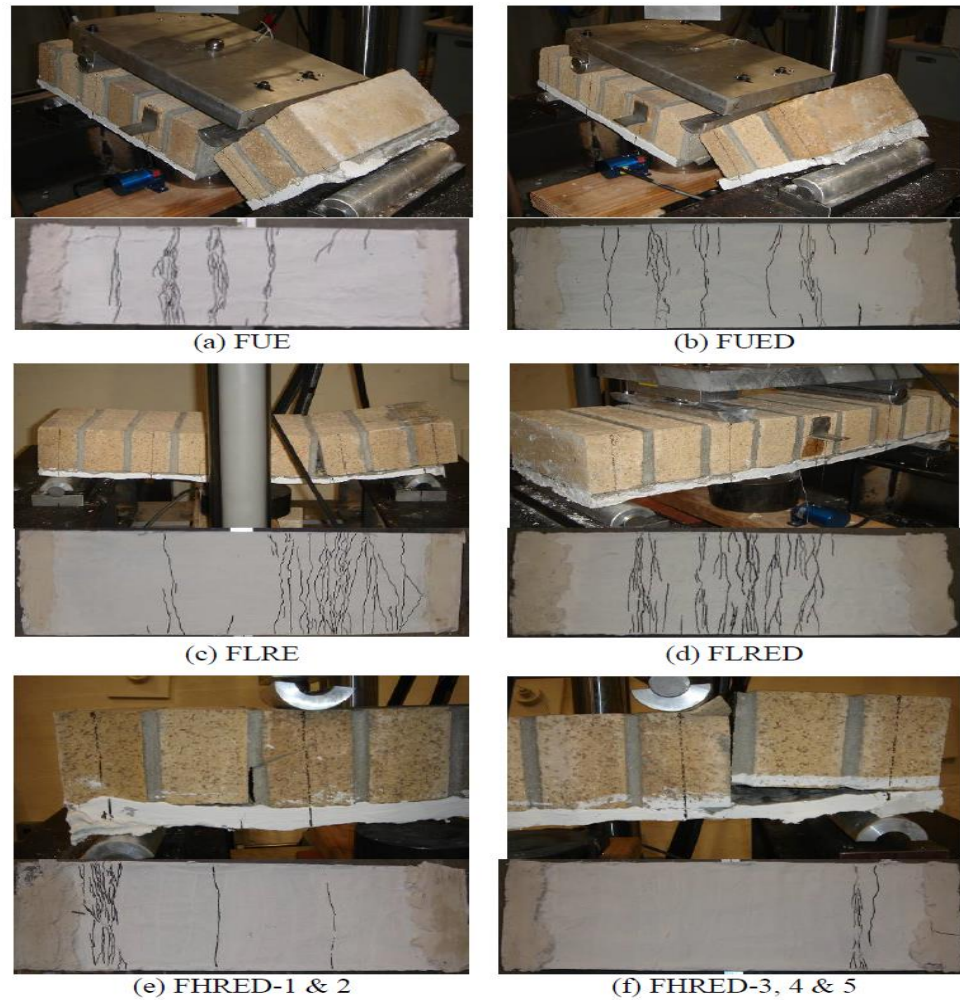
Failure mode of retrofitted masonry beams a) 13 mm ECC layer b) 13 mm ECC layer and dowels c) 13 mm ECC layer and 0.125% steel reinforcement d) 13 mm ECC layer and 0.125% steel reinforcement and dowels e&f) 13 mm ECC layer and 0.125% steel reinforcement d) 13 mm ECC layer and 1% steel reinforcement and dowels. (Kyriakides and Billington, 2008)
